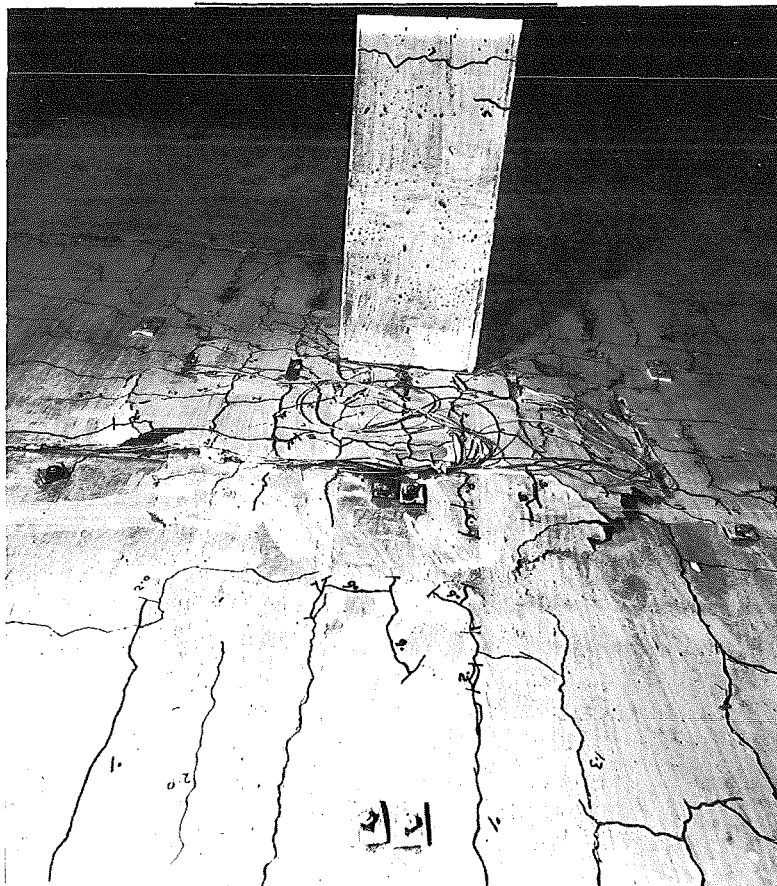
FAILURE SURFACE OF SPECIMEN 1
